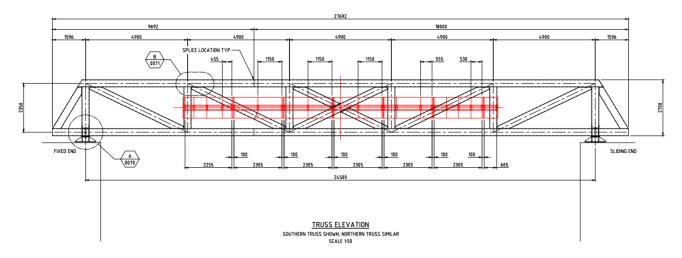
Engineering layout for Truss Façade over the concrete girder on Bridge St
